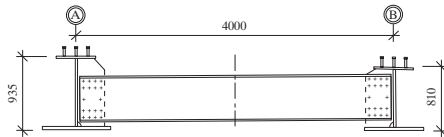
Cross-section of the steel structure, c/c cross-girders 7,0 m (Units: mm)
